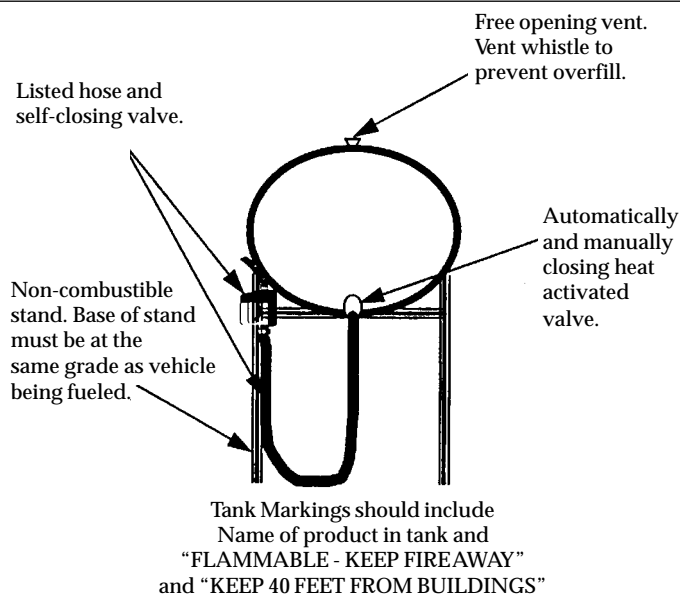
Aboveground storage tanks elevated for gravity discharge (maximum size 1,100 gallons).
